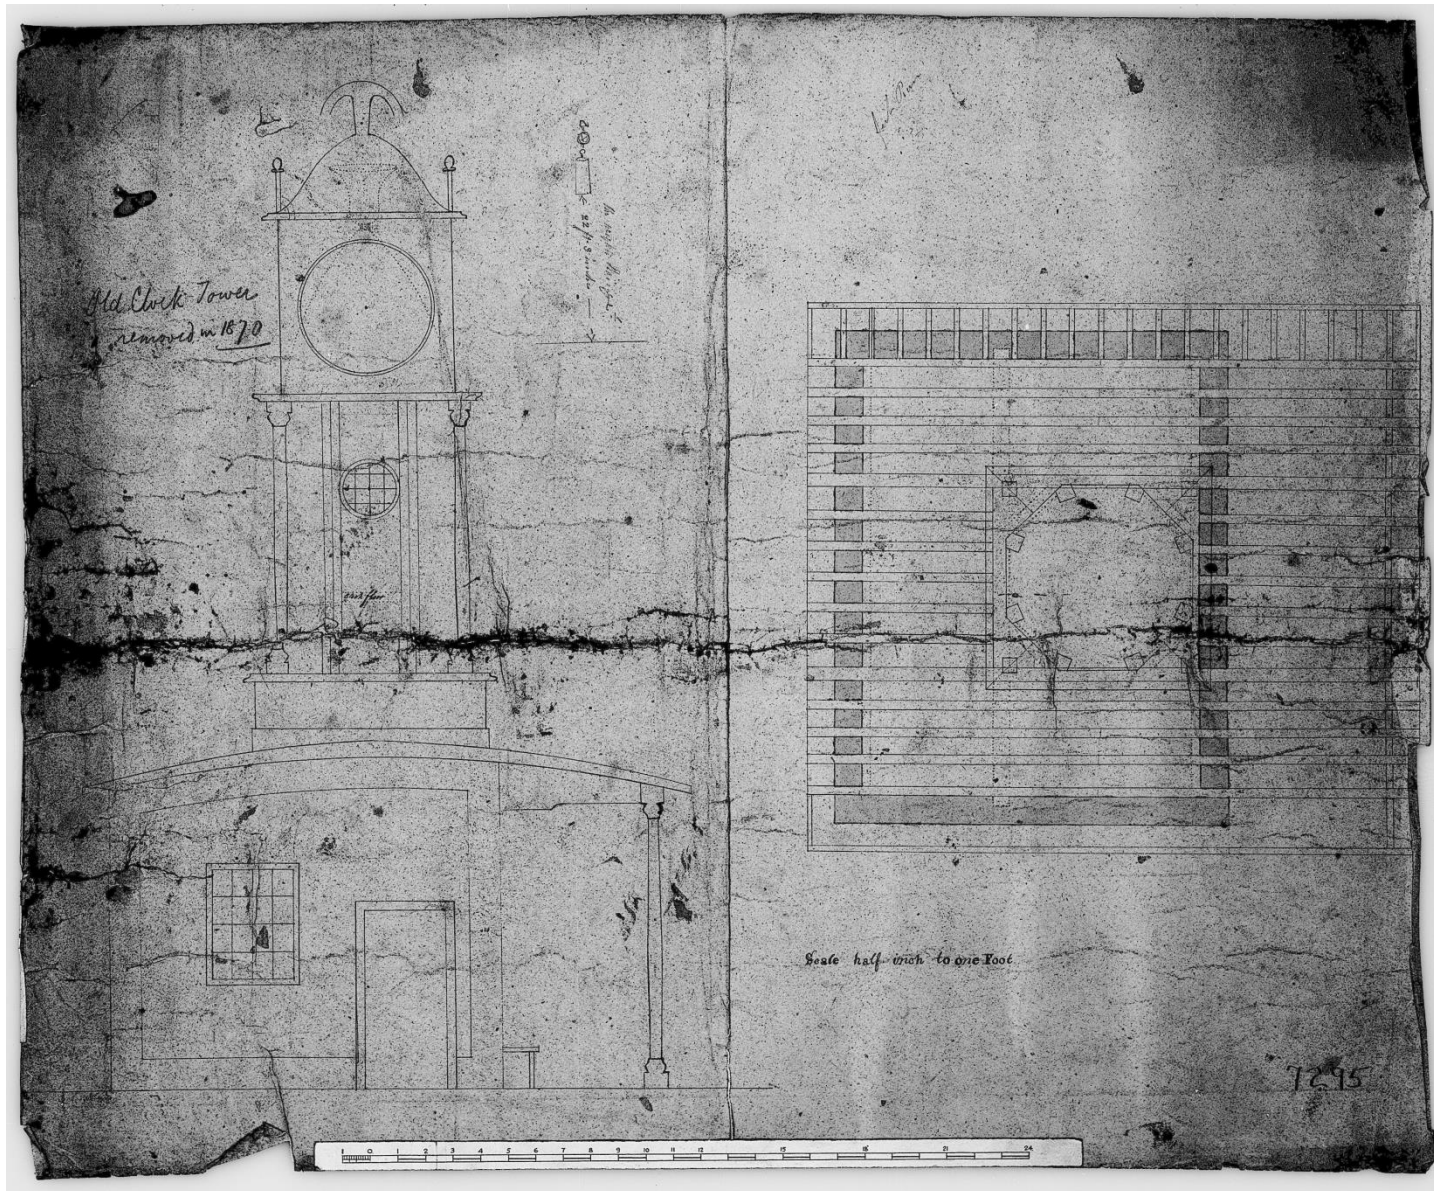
Drawing plans for the old clock tower, c. 1819, DHB Historical Drawings Archive 7295.
